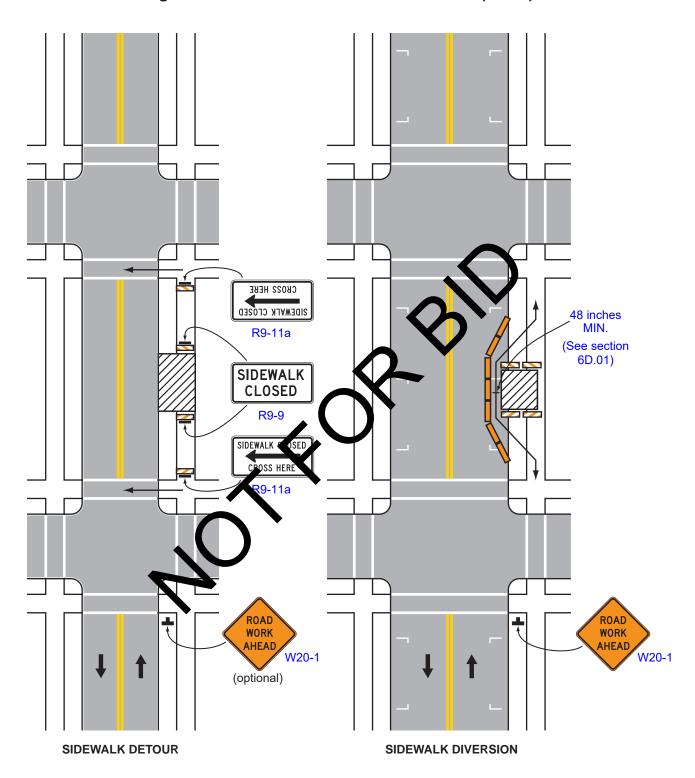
H-28. Sidewalk Detour or Diversion (TA-28)
